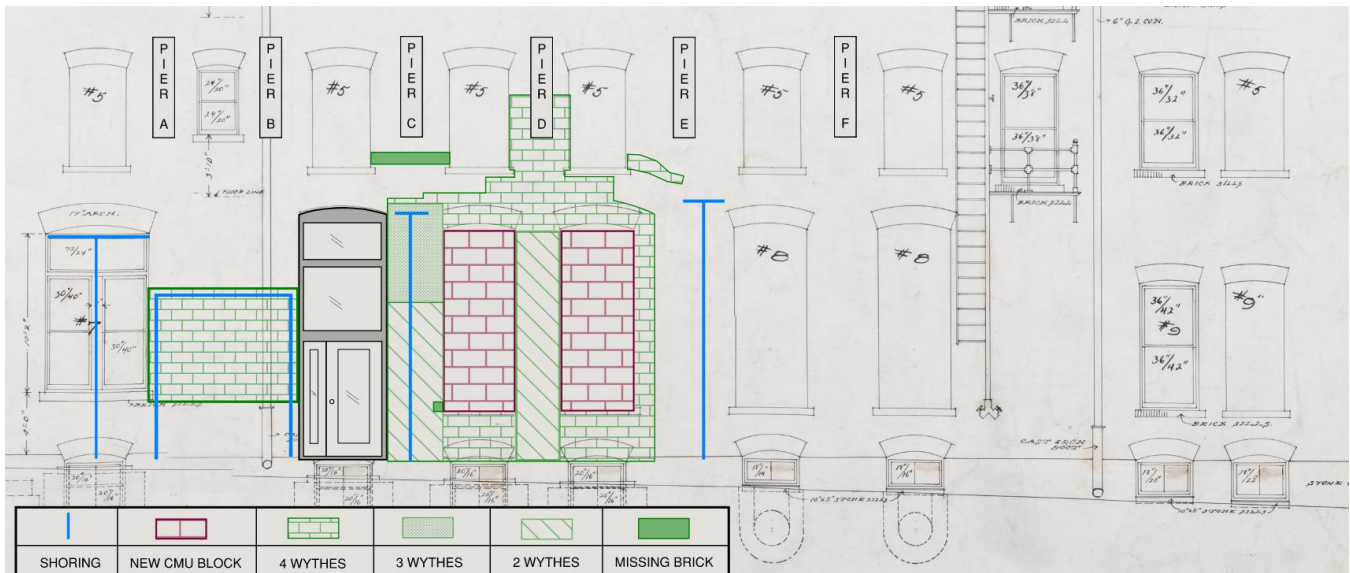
West elevation markup indicating assumed amounts of remaining brick after brick removal prior to collapse on May 28, 2023.
